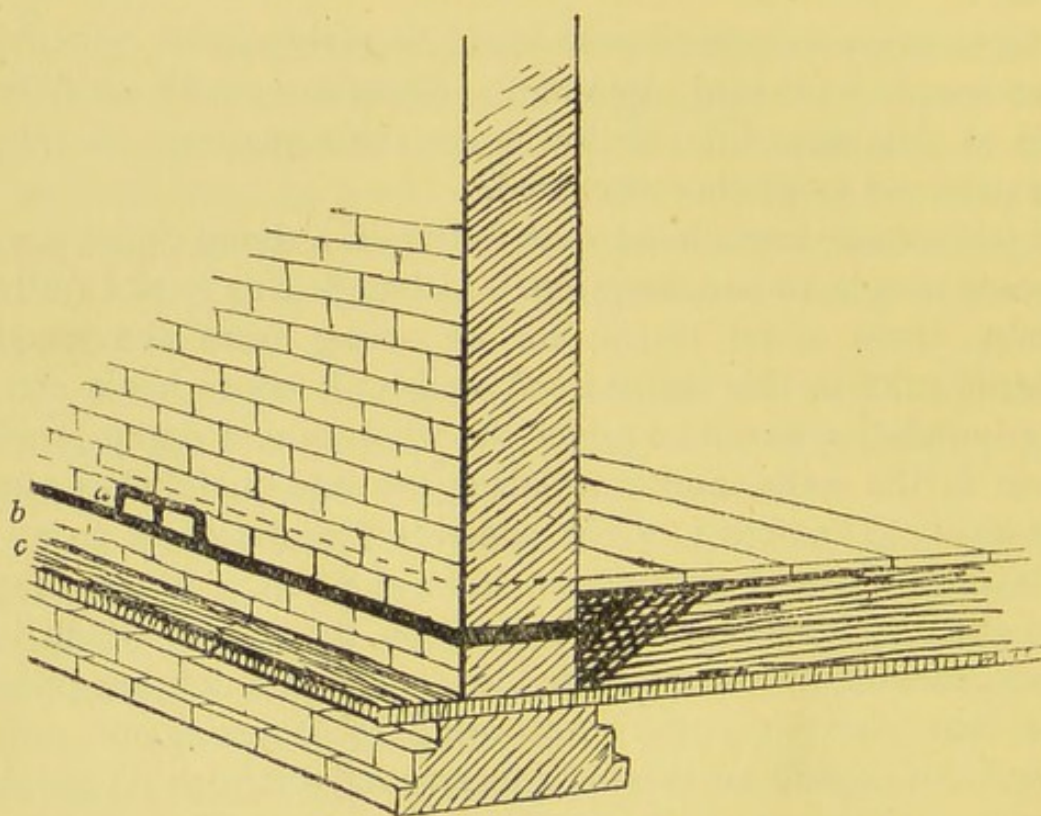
FOUNDATIONS OF A HOUSE, SHOWING VENTILATING GRATING (a), DAMP-PROOF COURSE (b), AND LAYER OF CONCRETE (c).
